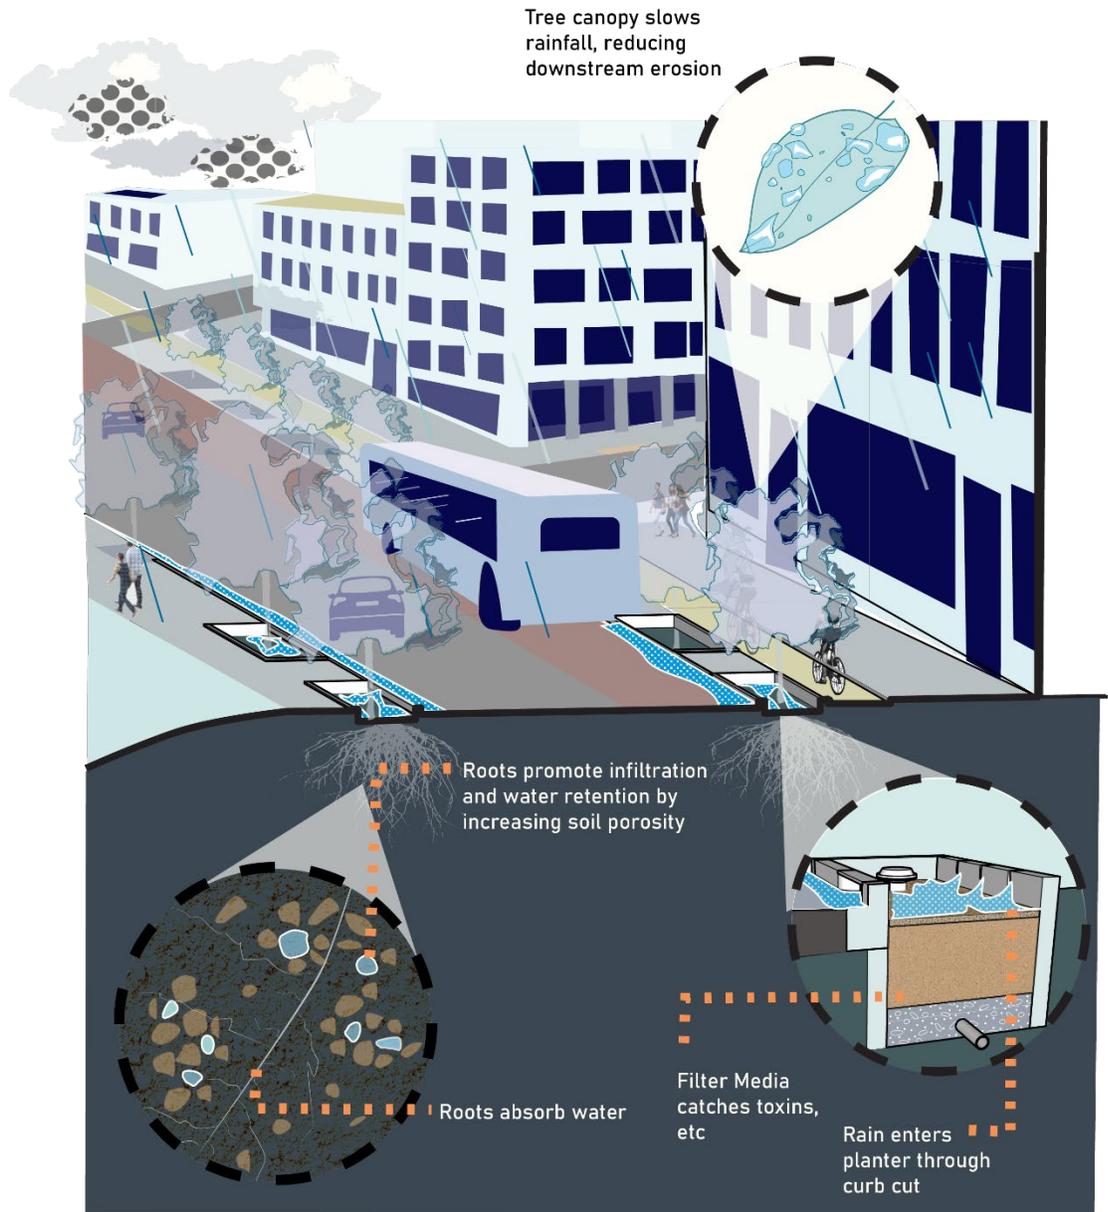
Mobilities and materialities of stormwater shown in typical proposed street conditions for at-grade boulevard
